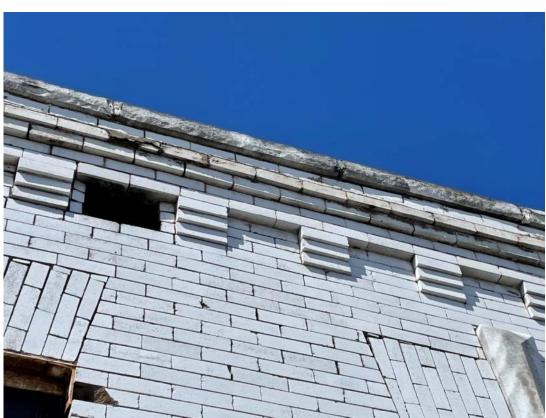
The existing parapets are deteriorated, missing or loose brick and exterior needs tuckpointing to prevent further deterioration.
